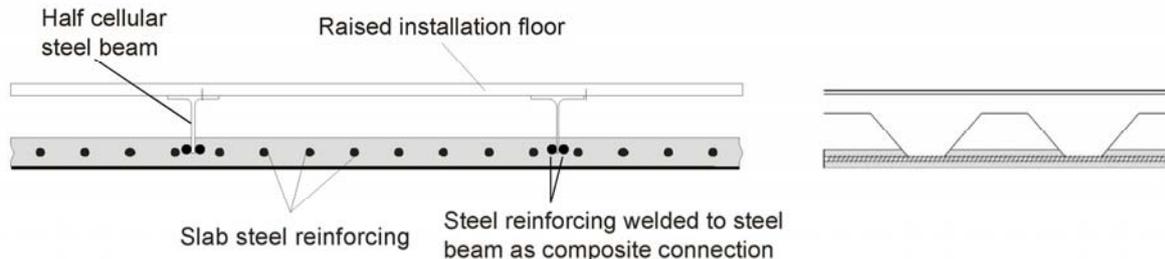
Novel type of composite slab with integrated installation floor using cellular beams: the concrete slab is placed on the bottom
